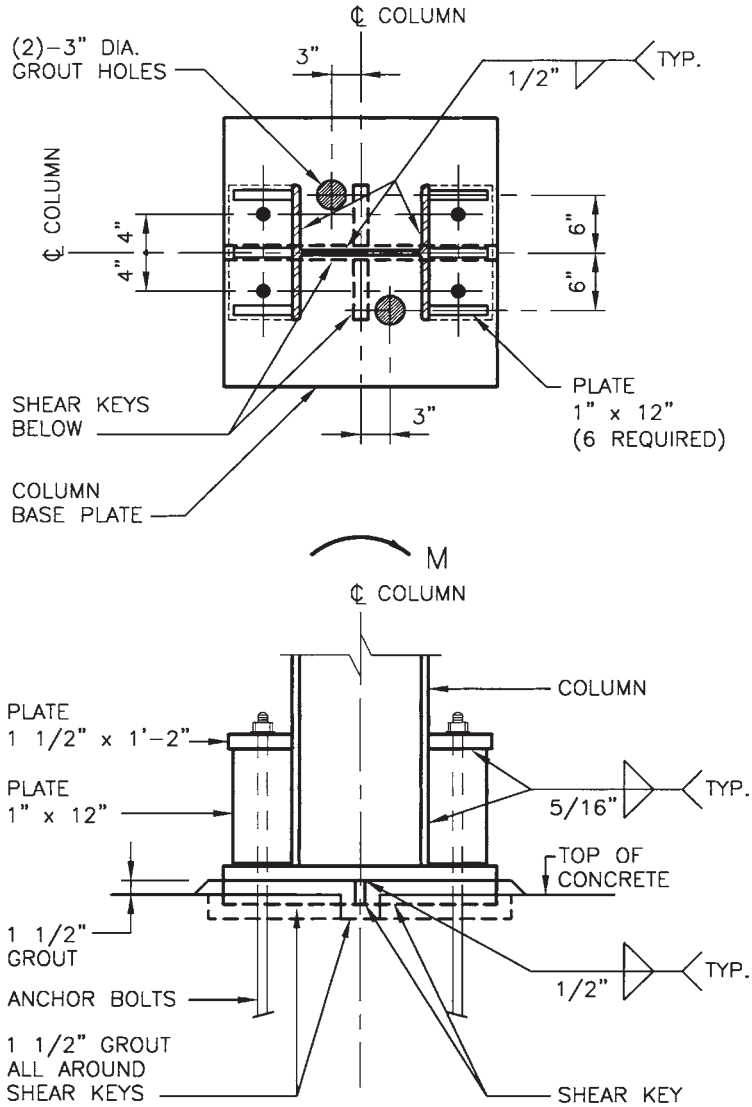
Typical detail for column fixity used in heavy structural steel buildings.
